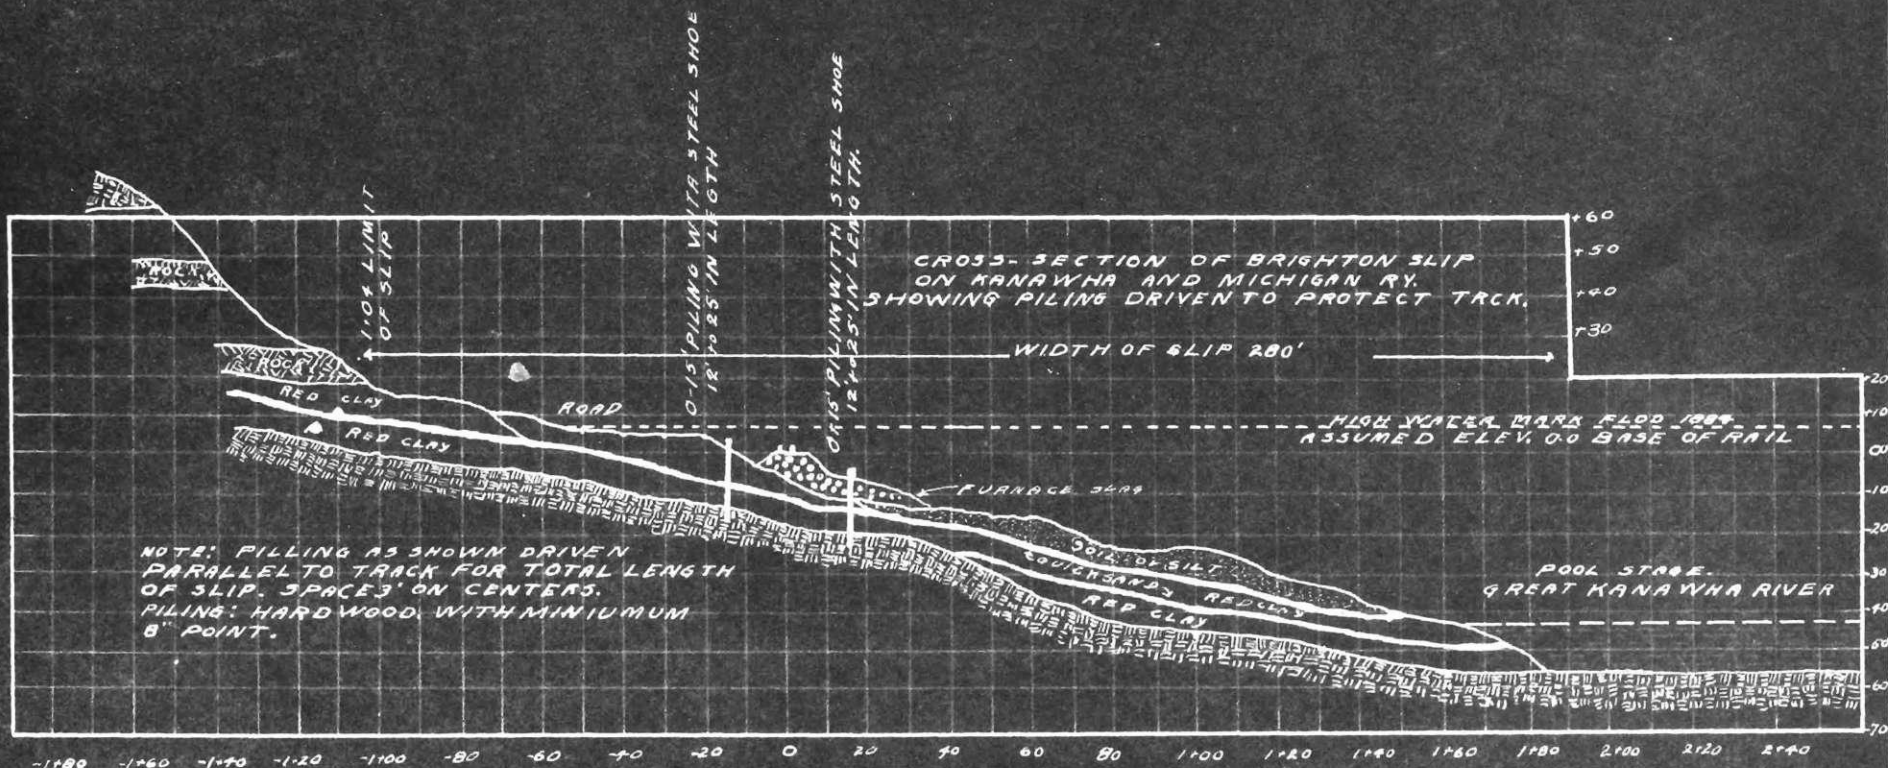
Cross Section of Brighton Slip showing Piling Driven to Protect Track.
